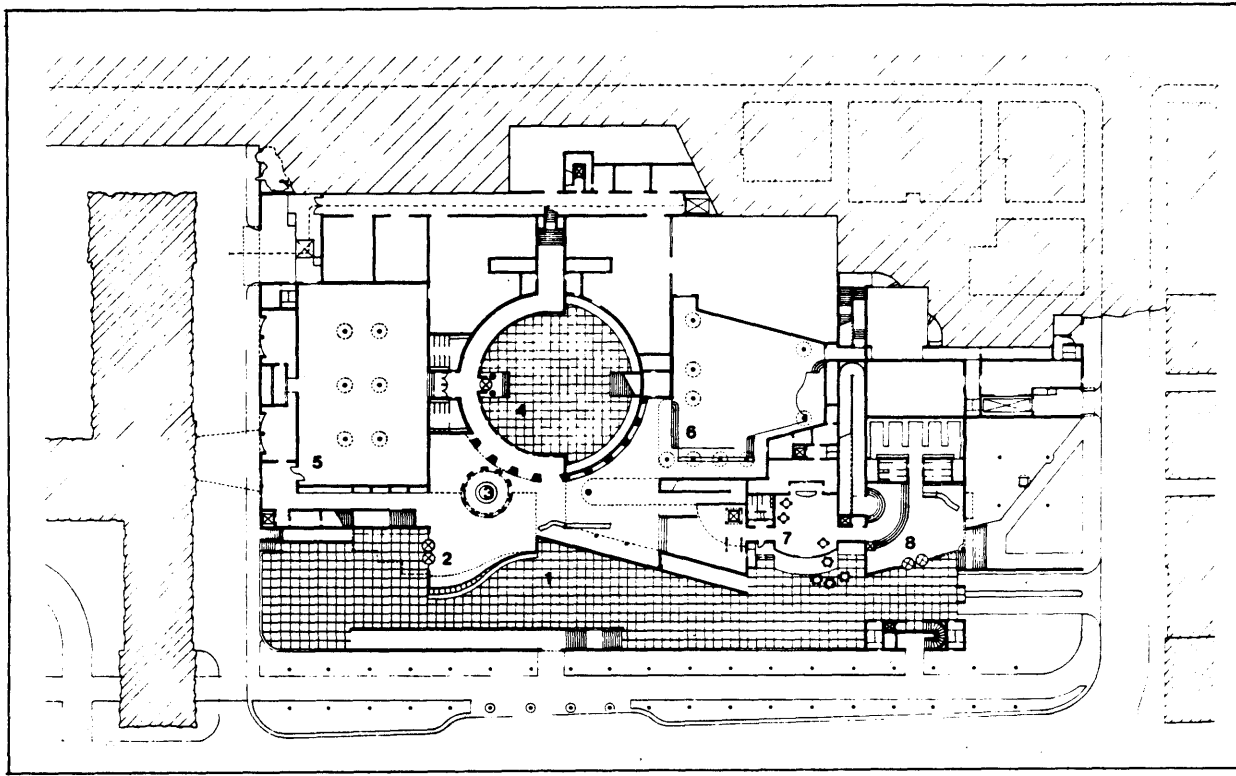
Plan of Neue Staatsgalerie, Stuttgart. Stirling. 1973-83
